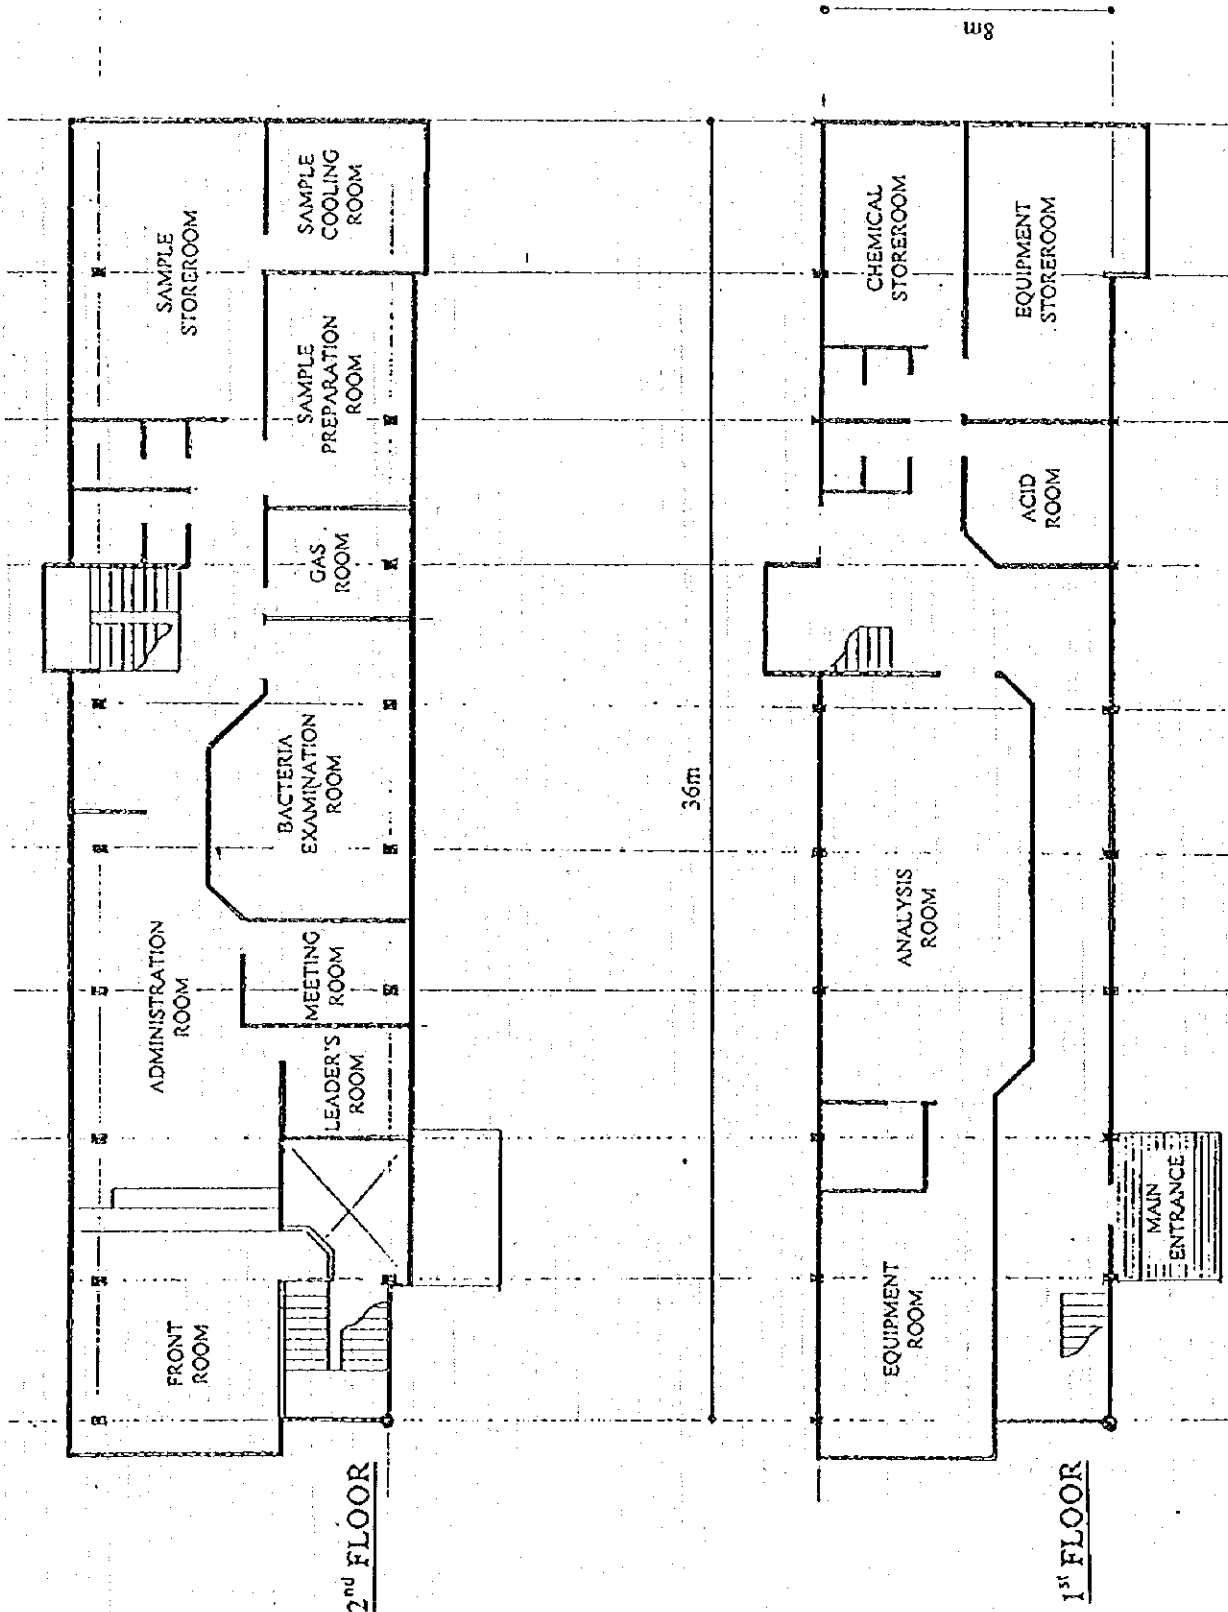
LAYOUT OF CENTRAL LABORATORY
